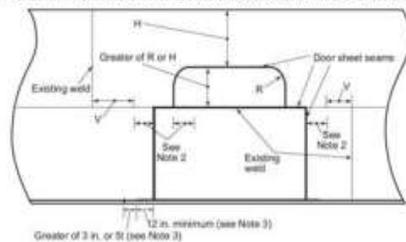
Details for Door Sheets in Riveted Seam Tank
